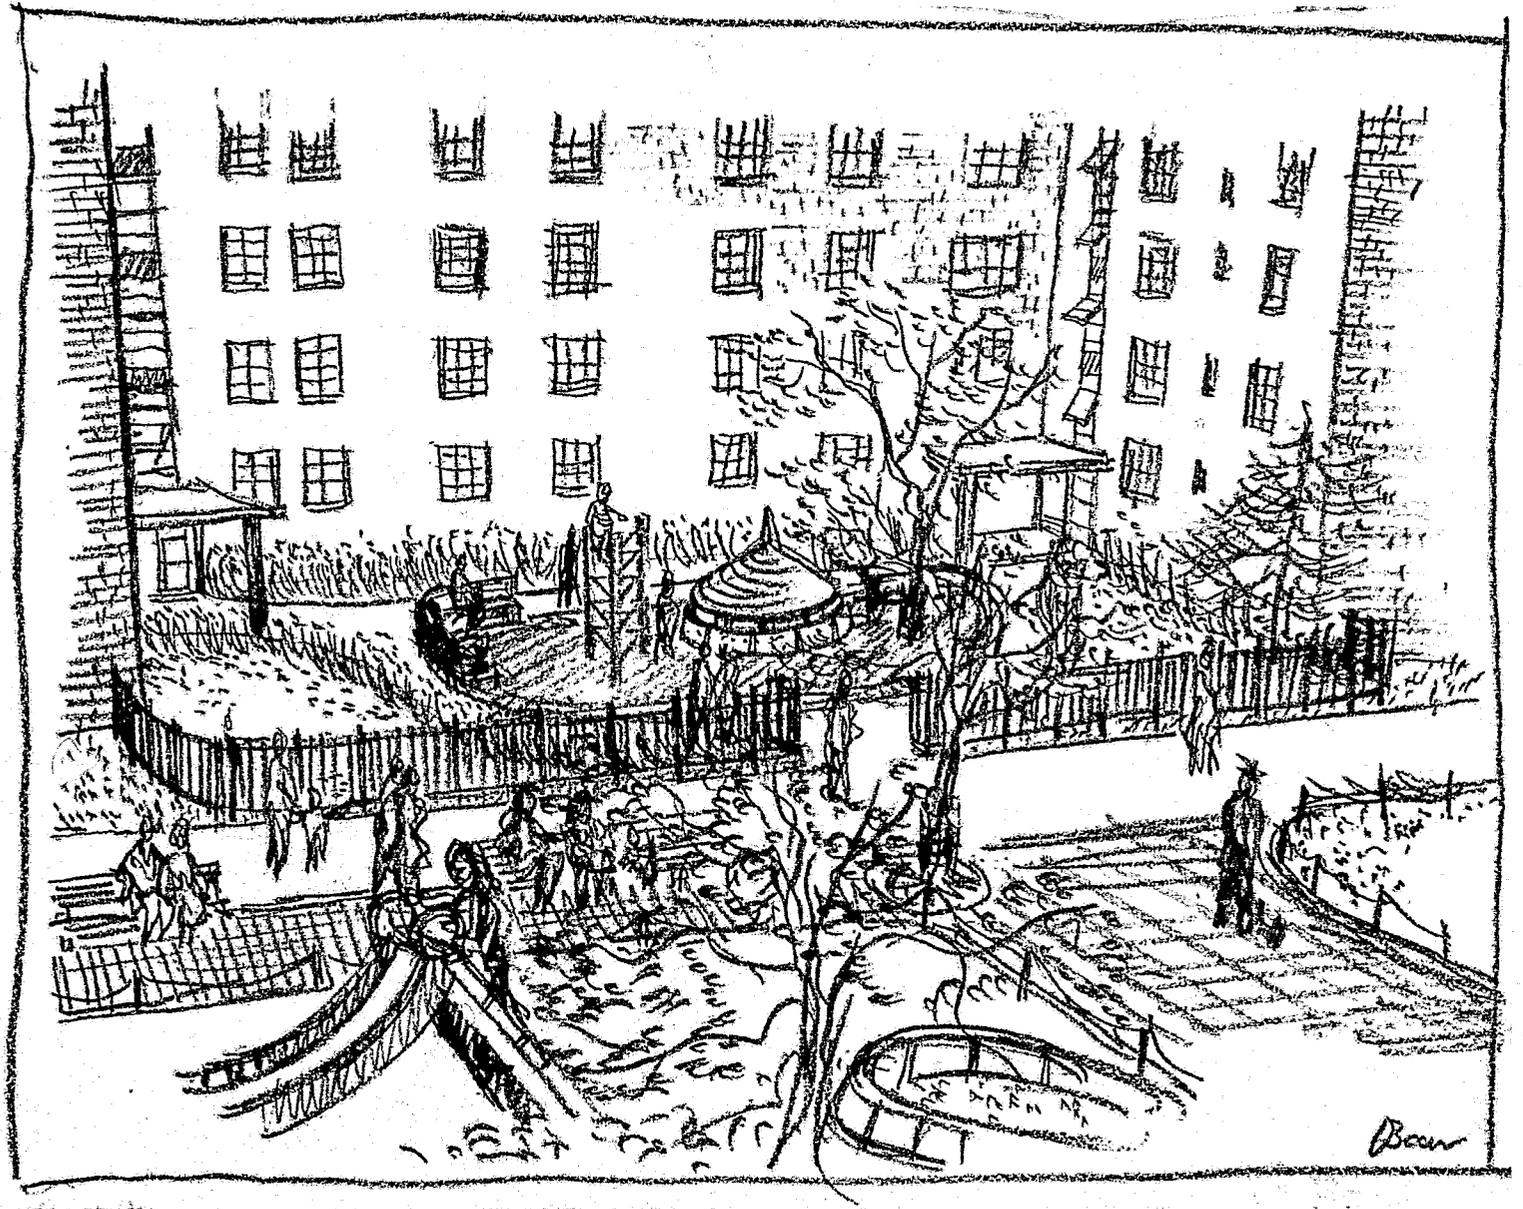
Sketch of recommended improvements in grounds of Edenwald Houses.
